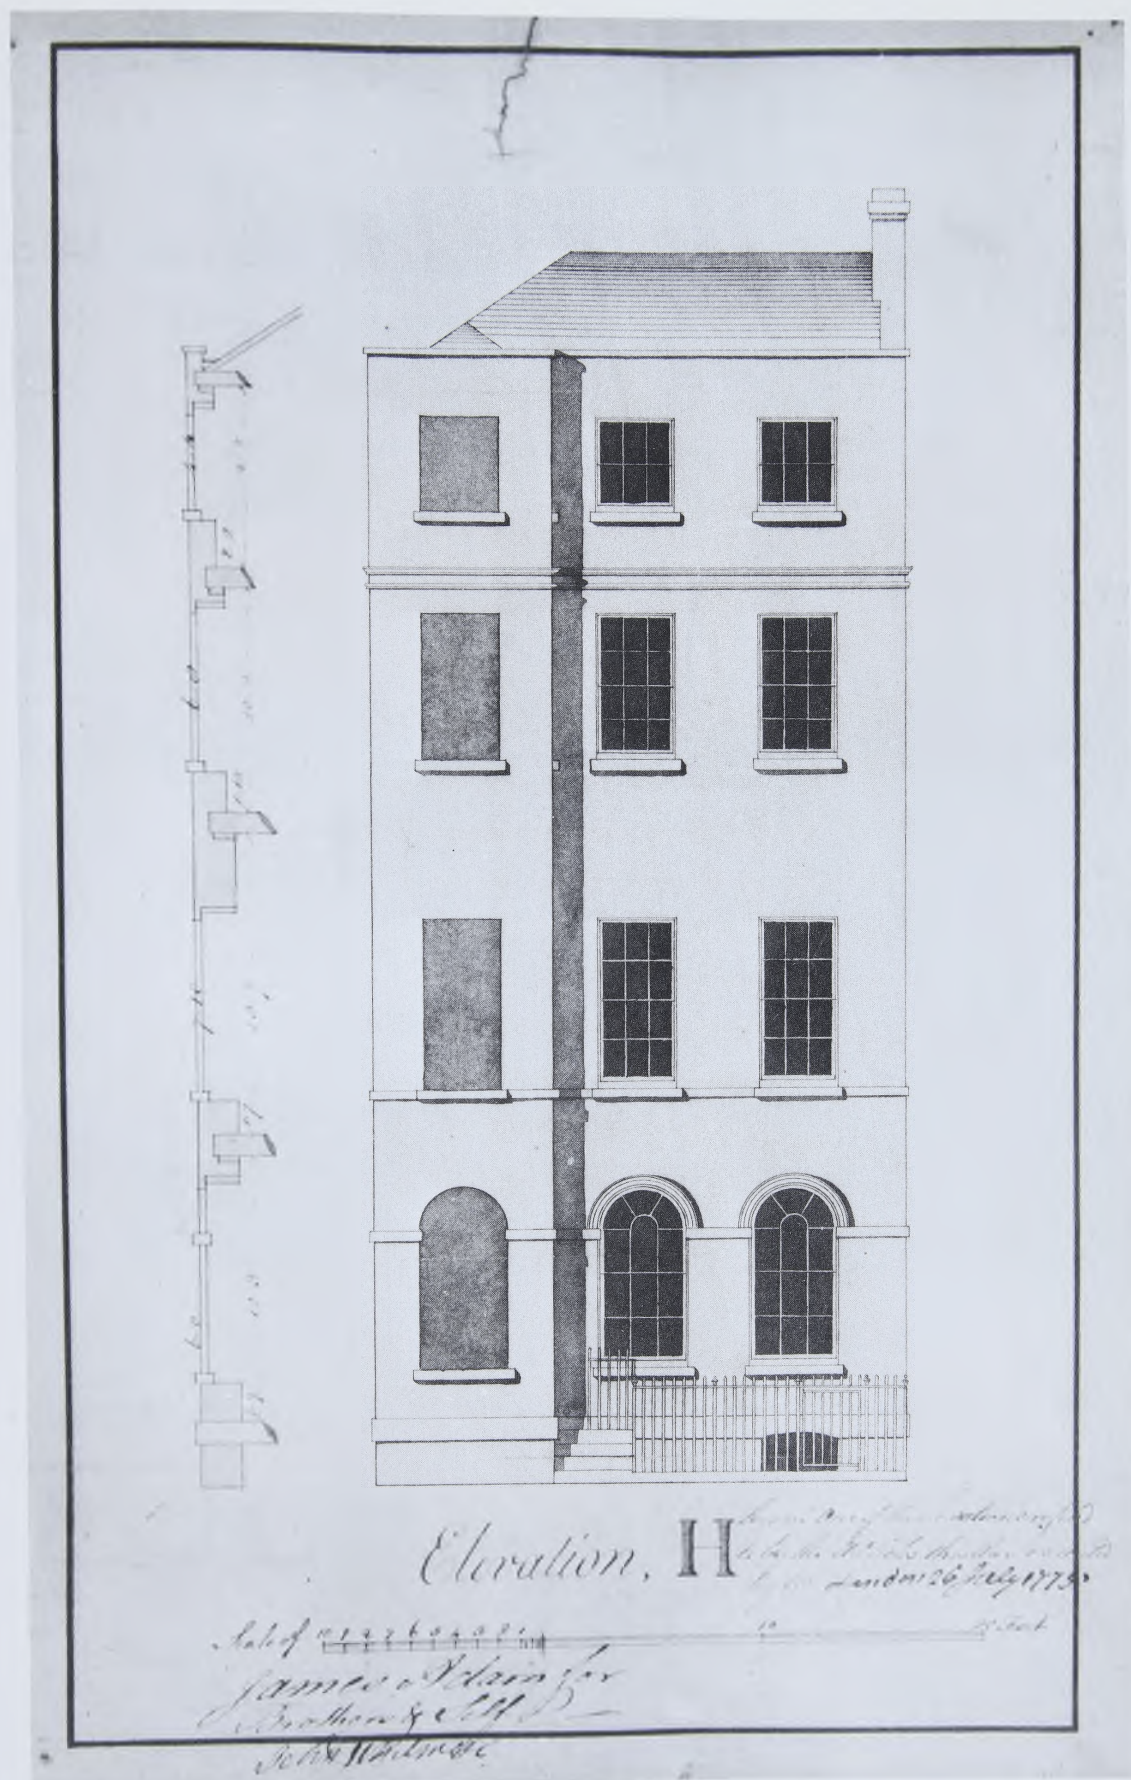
James Adam. London, No.6 Frederick's Place (Old Jewry): Elevation and wall section, 1775
